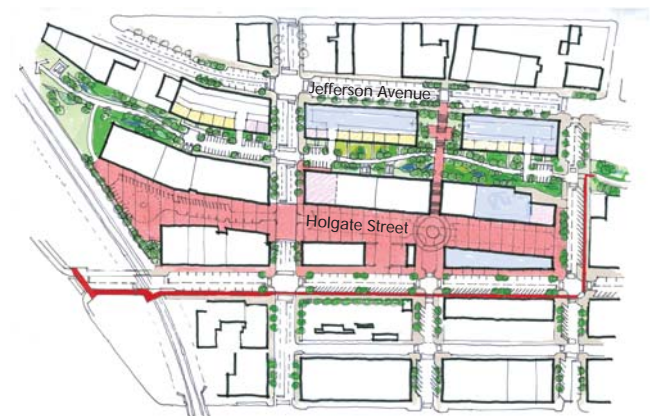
A conceptual plan drawing illustrating Holgate as a brick-paved shared-use street and the potential for a landscaped pedestrian pathway between the repurposed buildings and new development along Jefferson Avenue.
